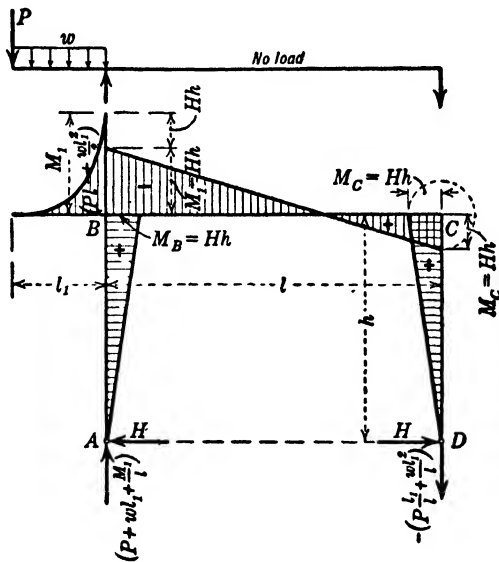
Right-angle Frame with Cantilever at One End. (See p. 281.)
